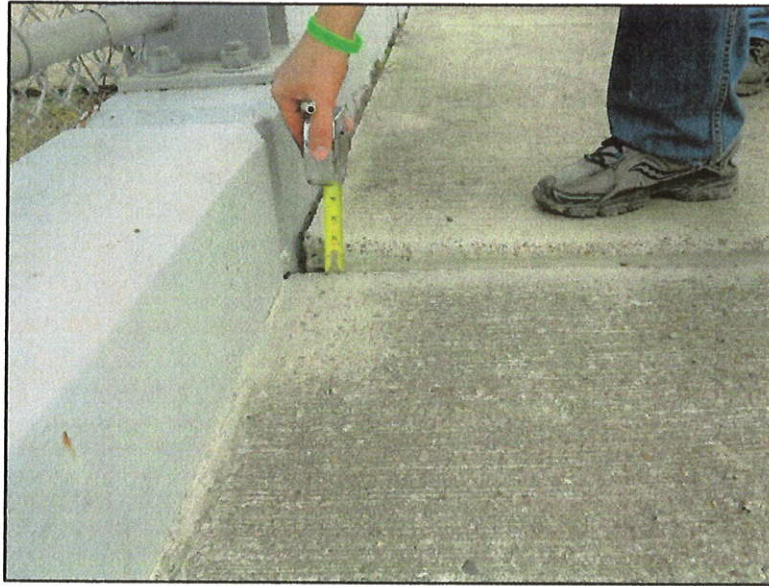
F is located at abutment 6. It shows differential movement at the sidewalk. Note that the sidewalk on the approach slab is approximately 1 ½" higher than the abutment 6 sidewalk.
